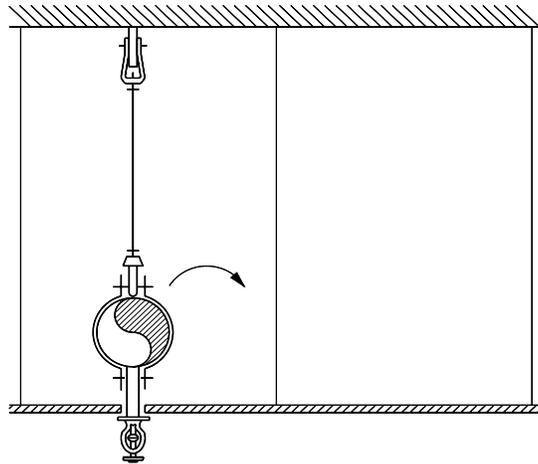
Sprinkler Pipe Sways and Impacts Suspended Ceiling
